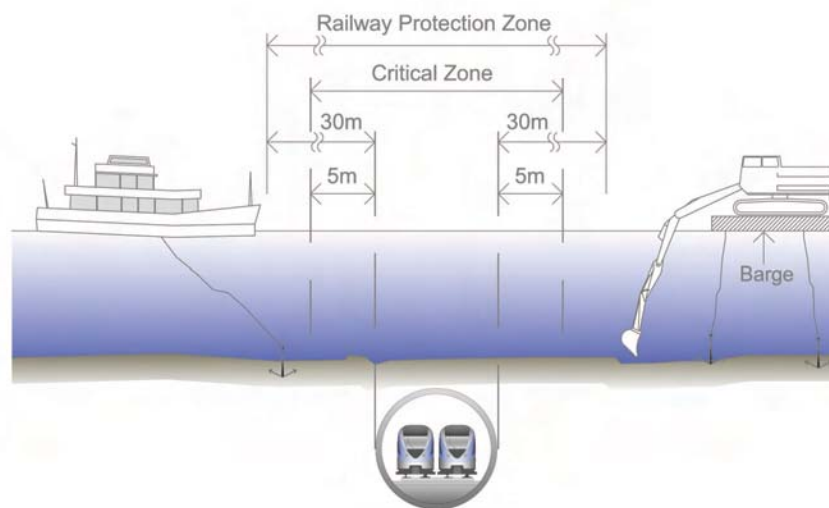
Anchoring of vessels should be outside the Critical Zone and dredging should be outside the Railway Protection Zone for tunnels
